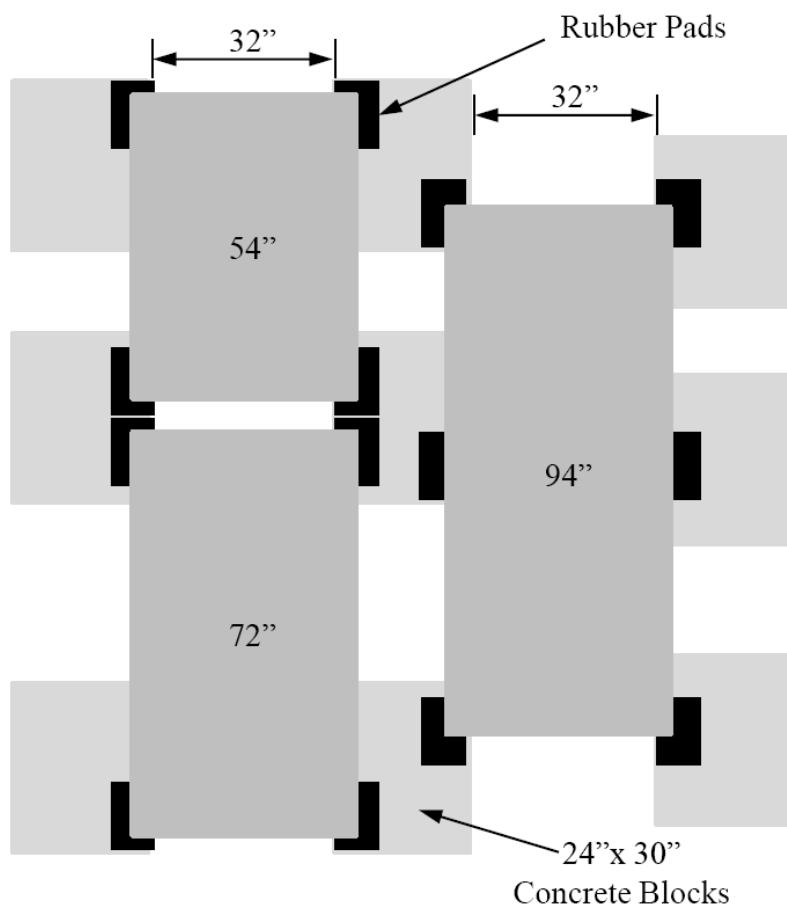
Orientation of walls placed horizontally for pullout testing
